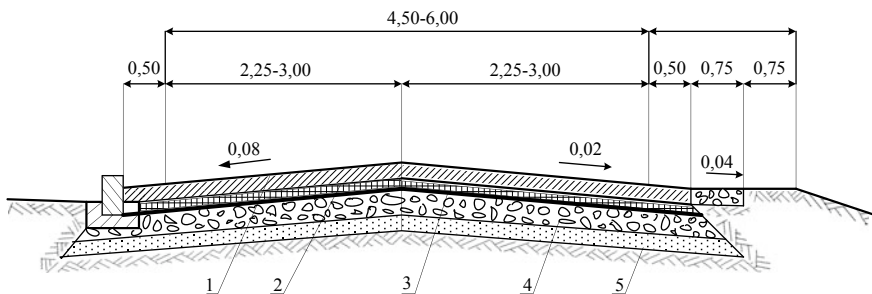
Constructive transverse profile of auto-drive-ways with a carriage-way width of 4.5–6.0 m; pavement design: 1—medium-grained asphalt concrete, $h = 4$ cm; 2—coarse-grained asphalt concrete, $h = 5$ cm; 3—burnt rock crushed stone impregnated with bitumen, $h = 6.5$ cm; 4—base of burnt rock crushed stone, $h = 20$ cm; 5—sandy underlying layer, $h = 10$ cm
